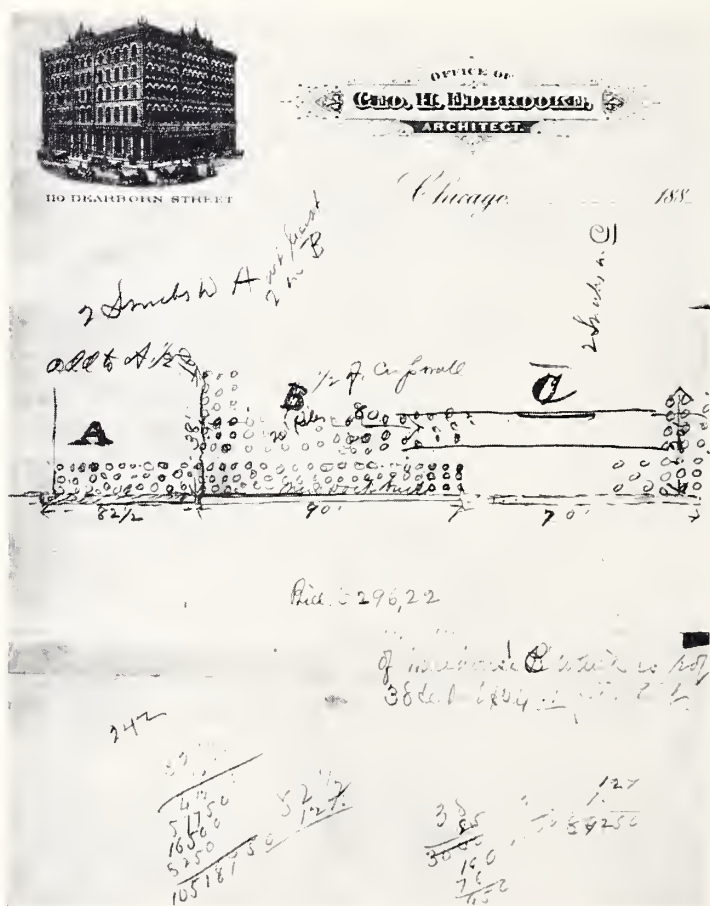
PILE PLAN FOR SIBLEY WAREHOUSE, 1883
